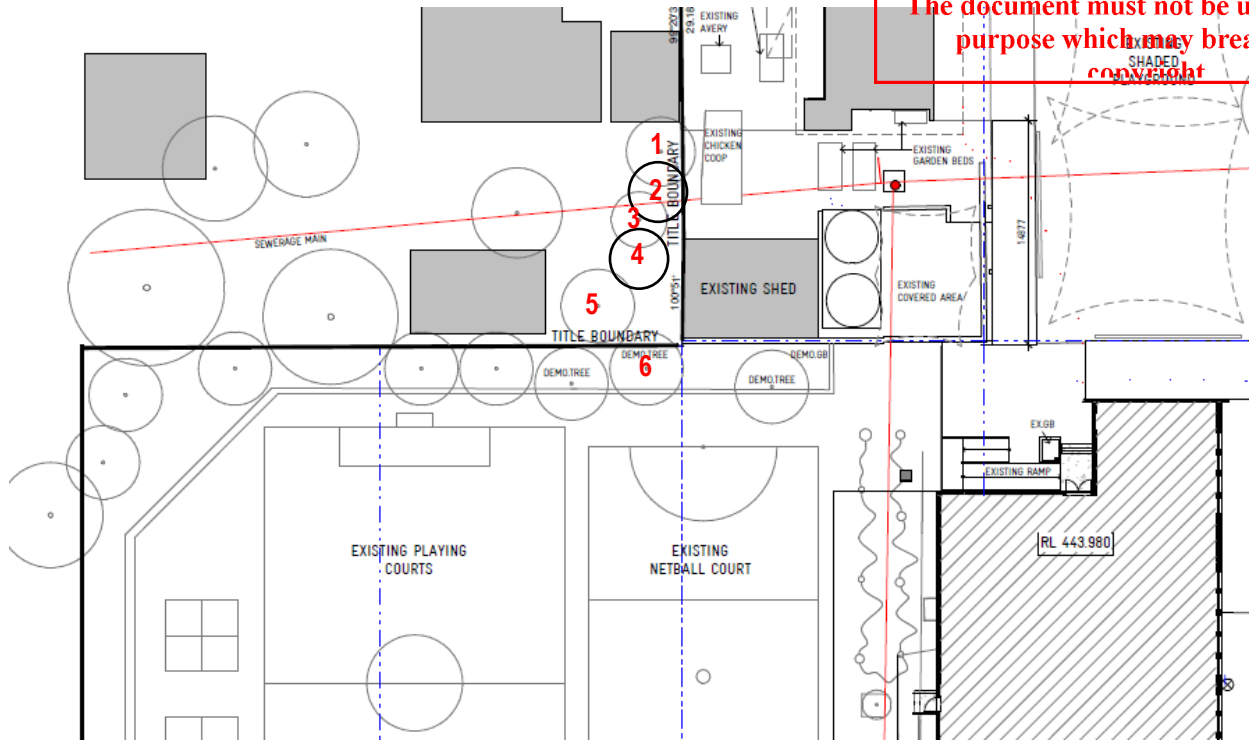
Excerpt from Existing Site Plan, St. Patrick's Parish Primary School (tree numbers added by author). (Y2 Architecture, March, 2021).
